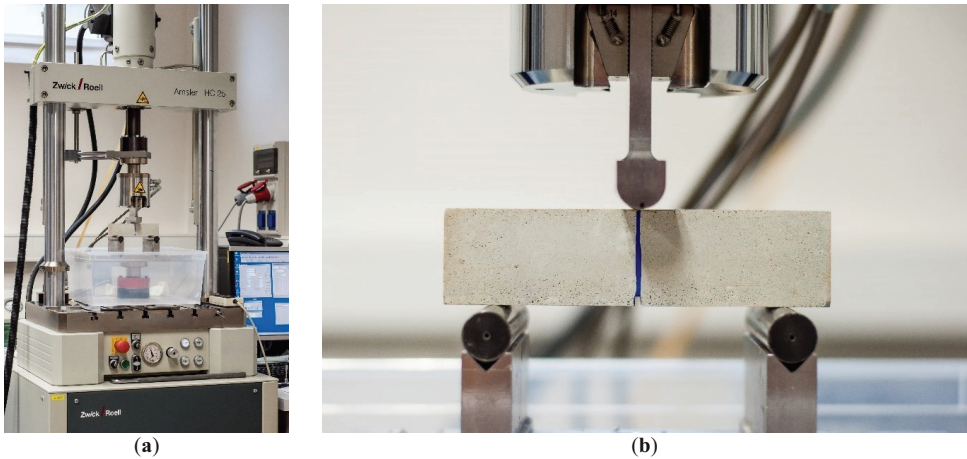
The testing machine used for cyclic/fatigue fracture test (a), the arrangement of cyclic test in 3PB configuration (b)
